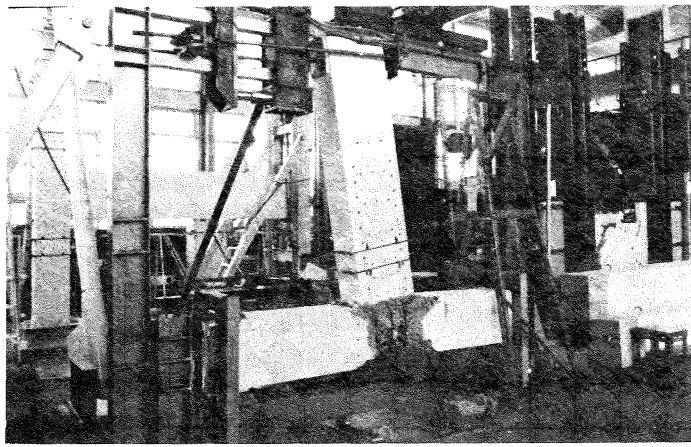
Reinforced Concrete Exterior Beam-Column Joint Core at Failure
